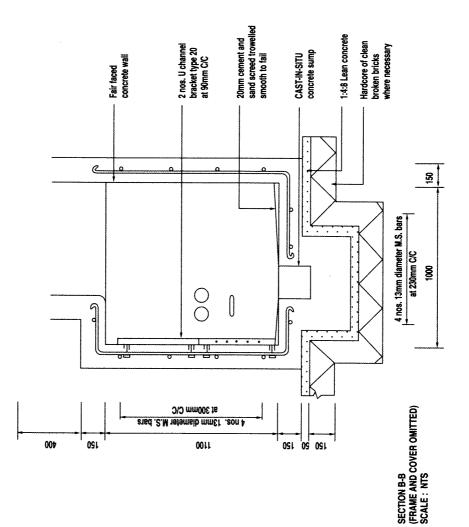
MANHOLE DRAWINGS - TYPE MX1
